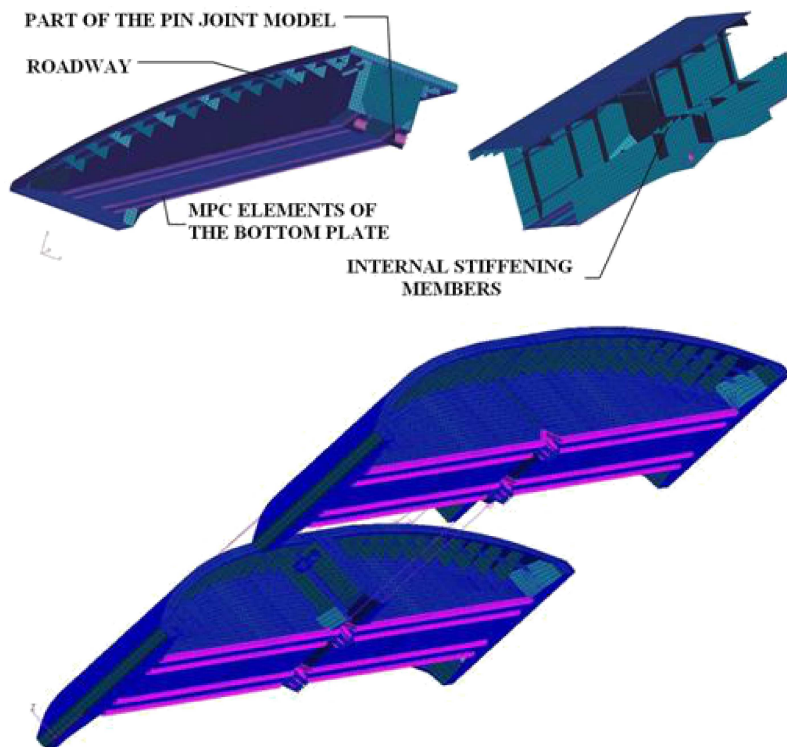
A 3D numerical model of a single treadway of a BLG bridge, longitudinal section of the girder segment and a complete FE model of a one span BLG bridge
